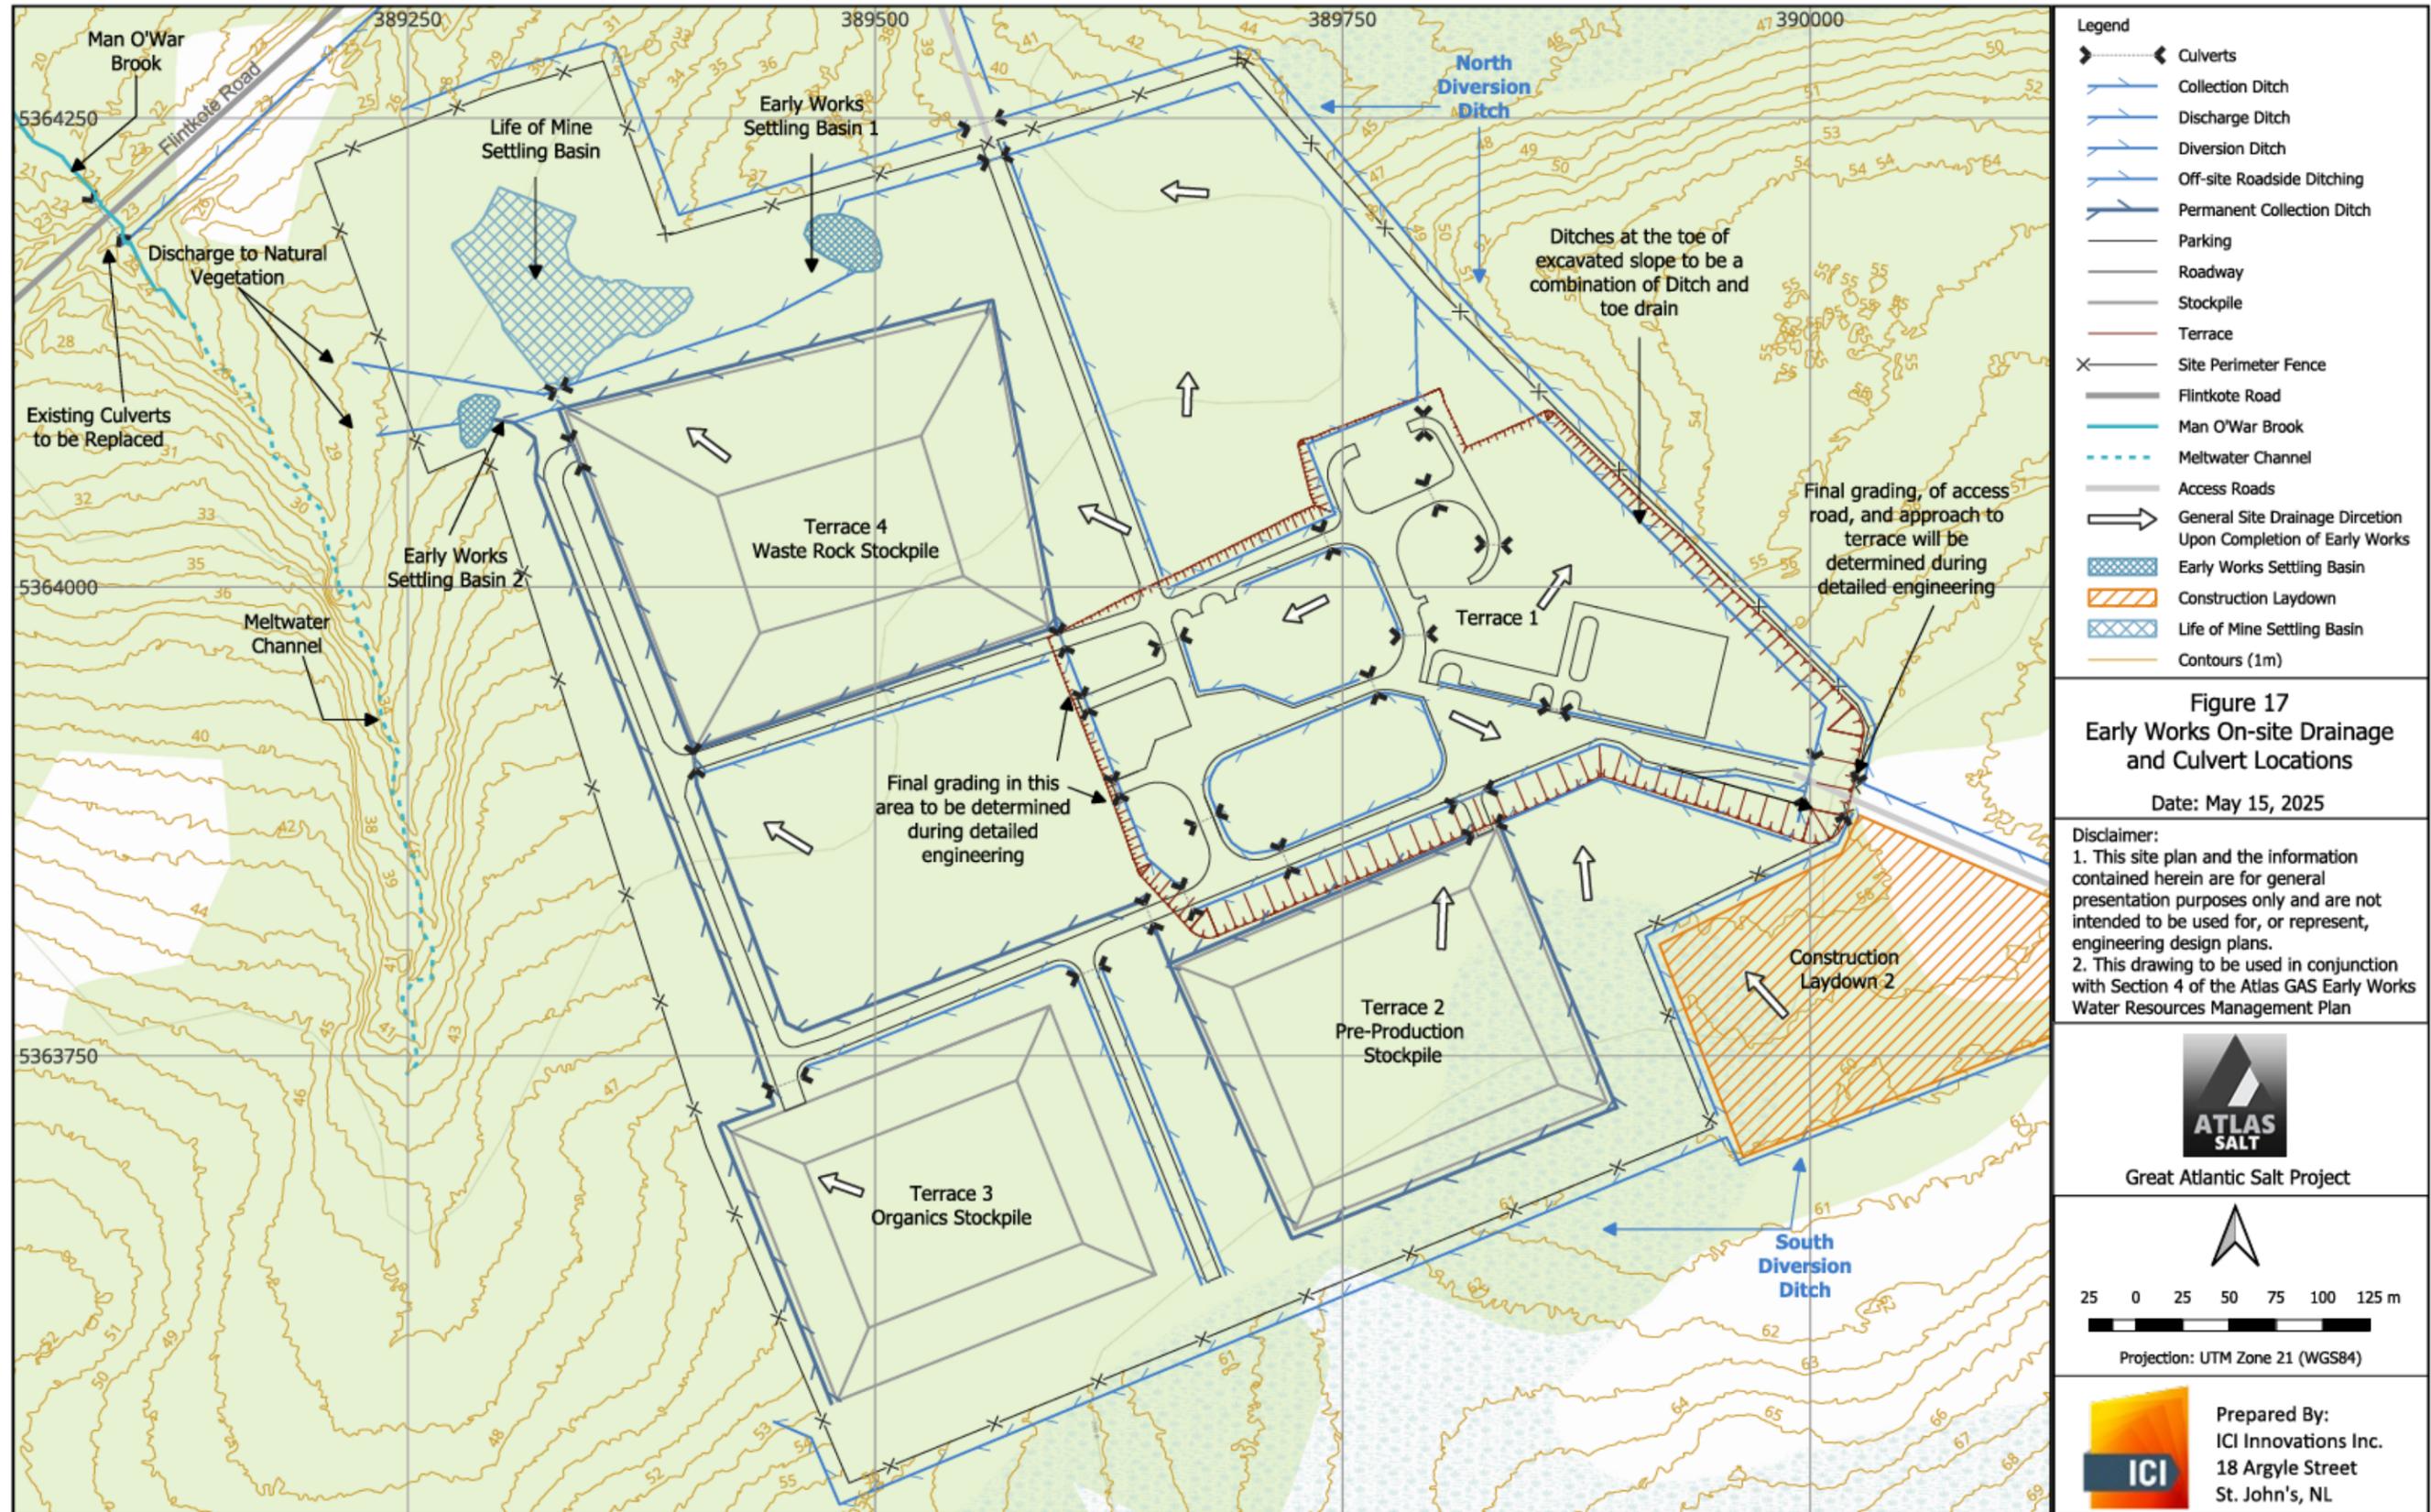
[Early Works Onsite Drainage and Culvert Location](#)
